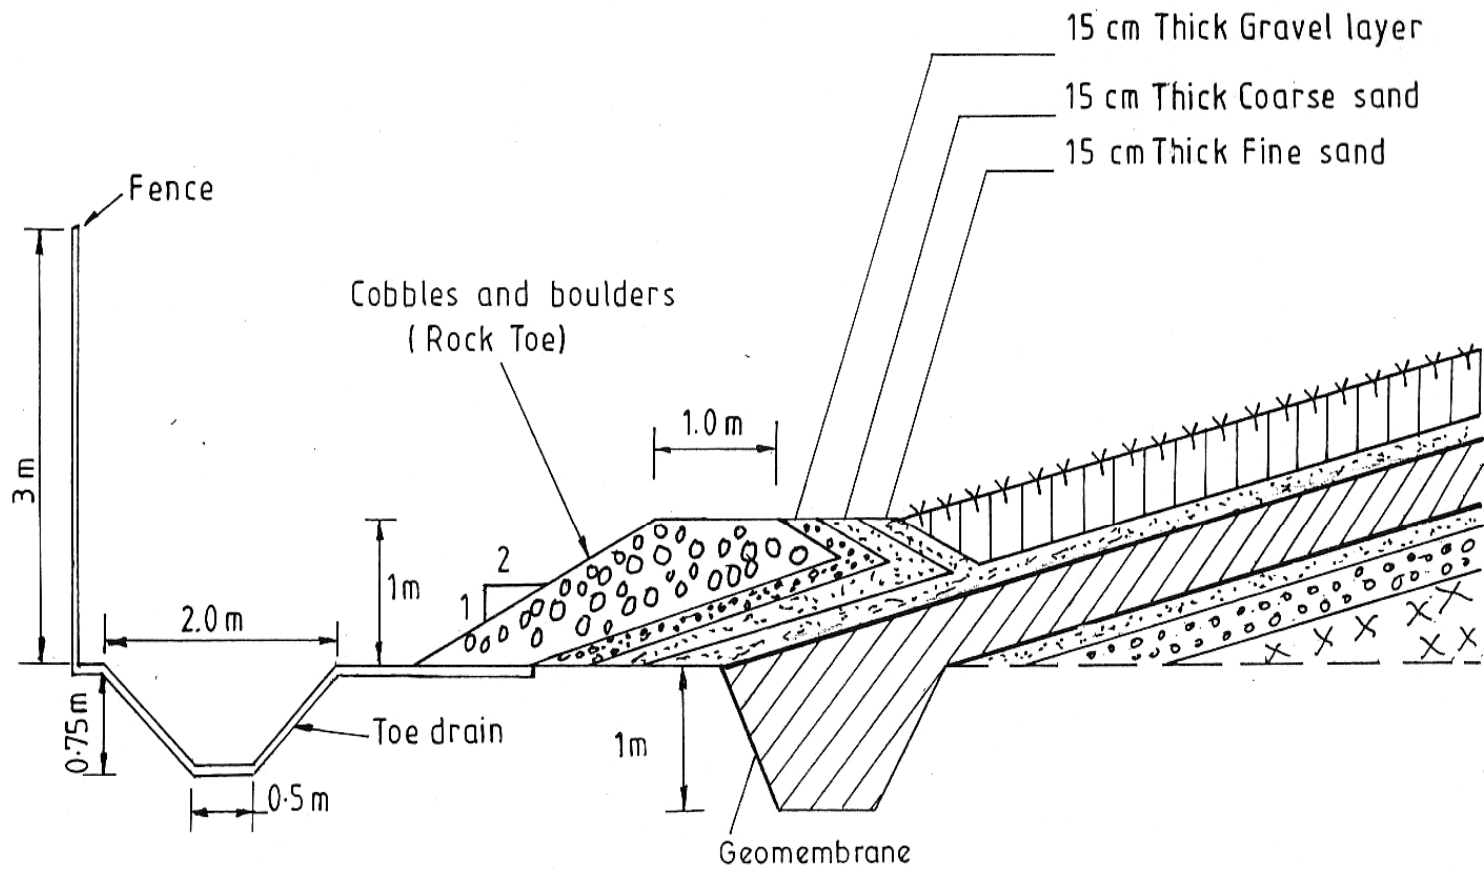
DETAILS OF ROCK TOE AND TOE DRAIN.
